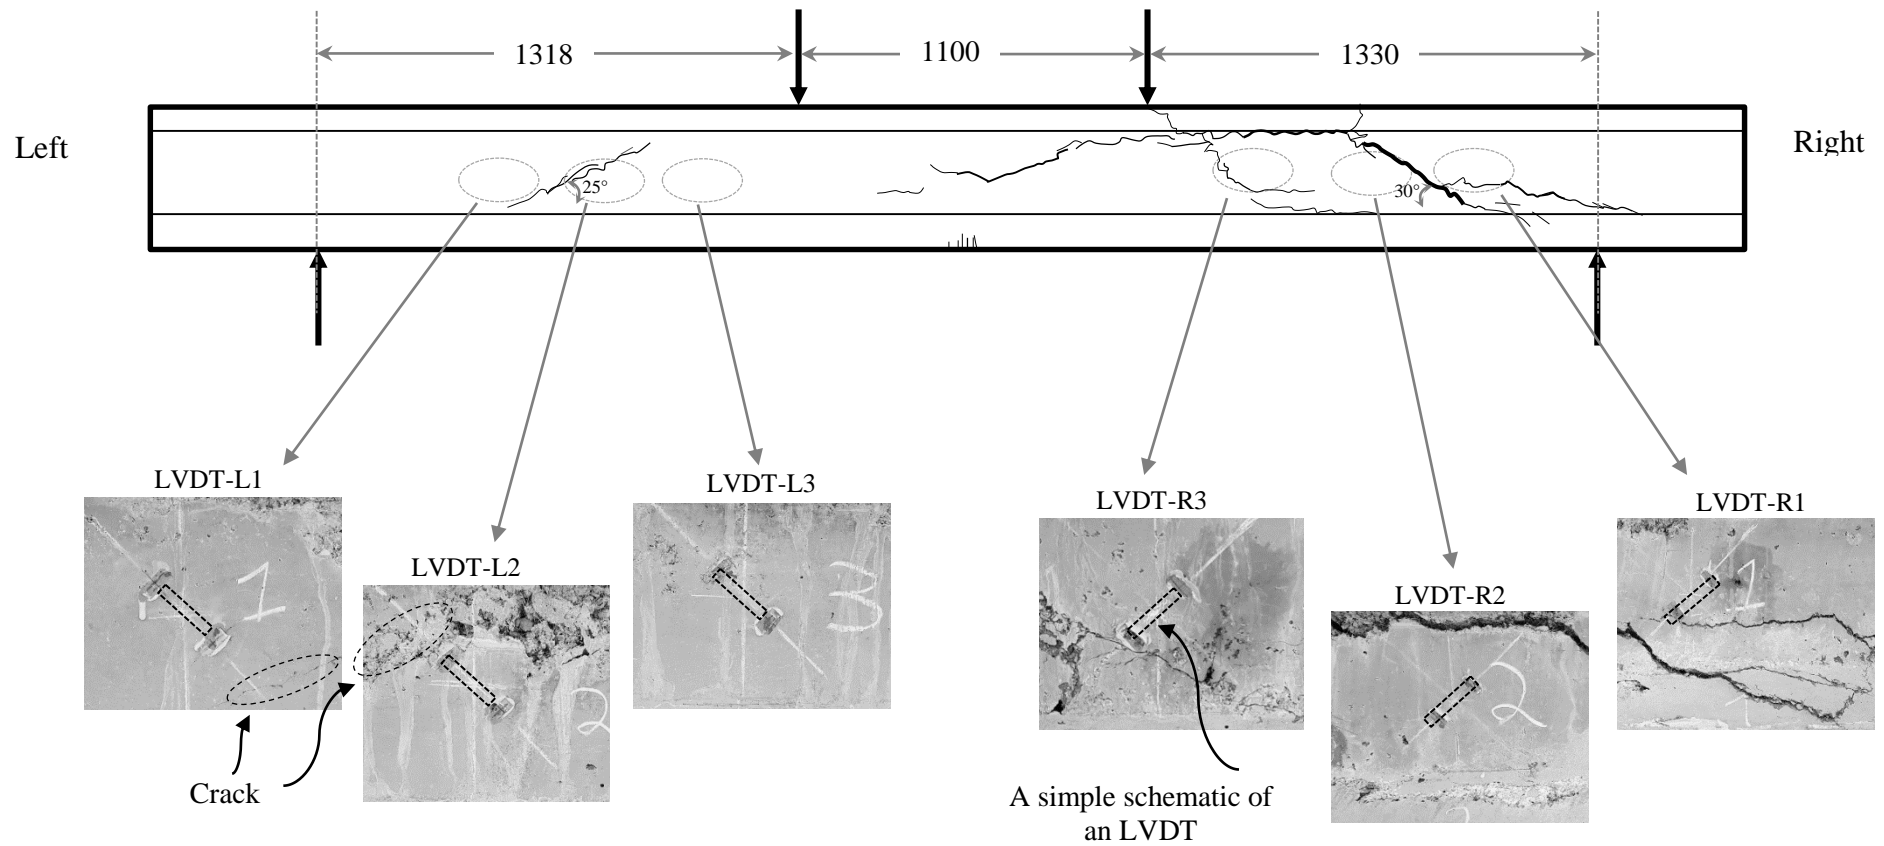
UHPFRC prestressed beam containing dolomite at the time of failure at the right shear span
